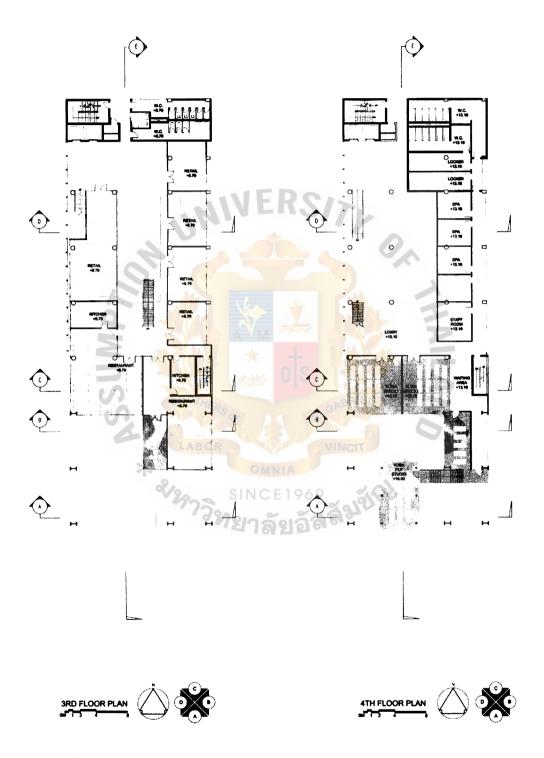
3rd floor plan and 4th floor plan (Image Source: Author's image)
